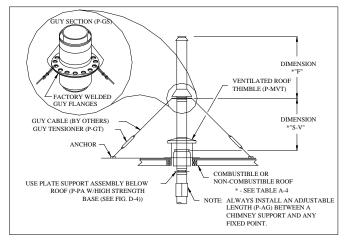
Guying Requirements for Chimneys Supported at Roof
